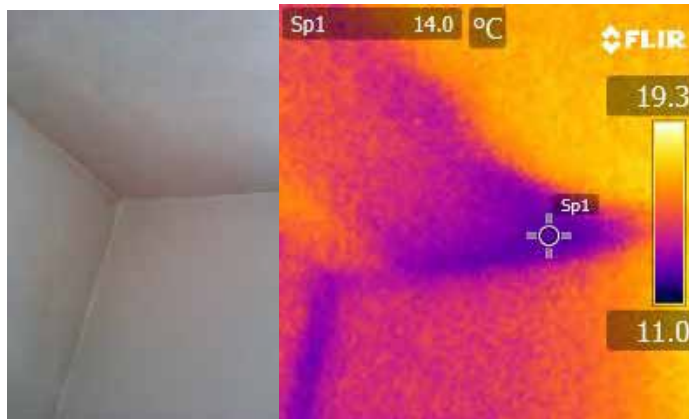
116 Abbeyforegate, Shrewsbury – first floor, south wall, wall ceiling junction
